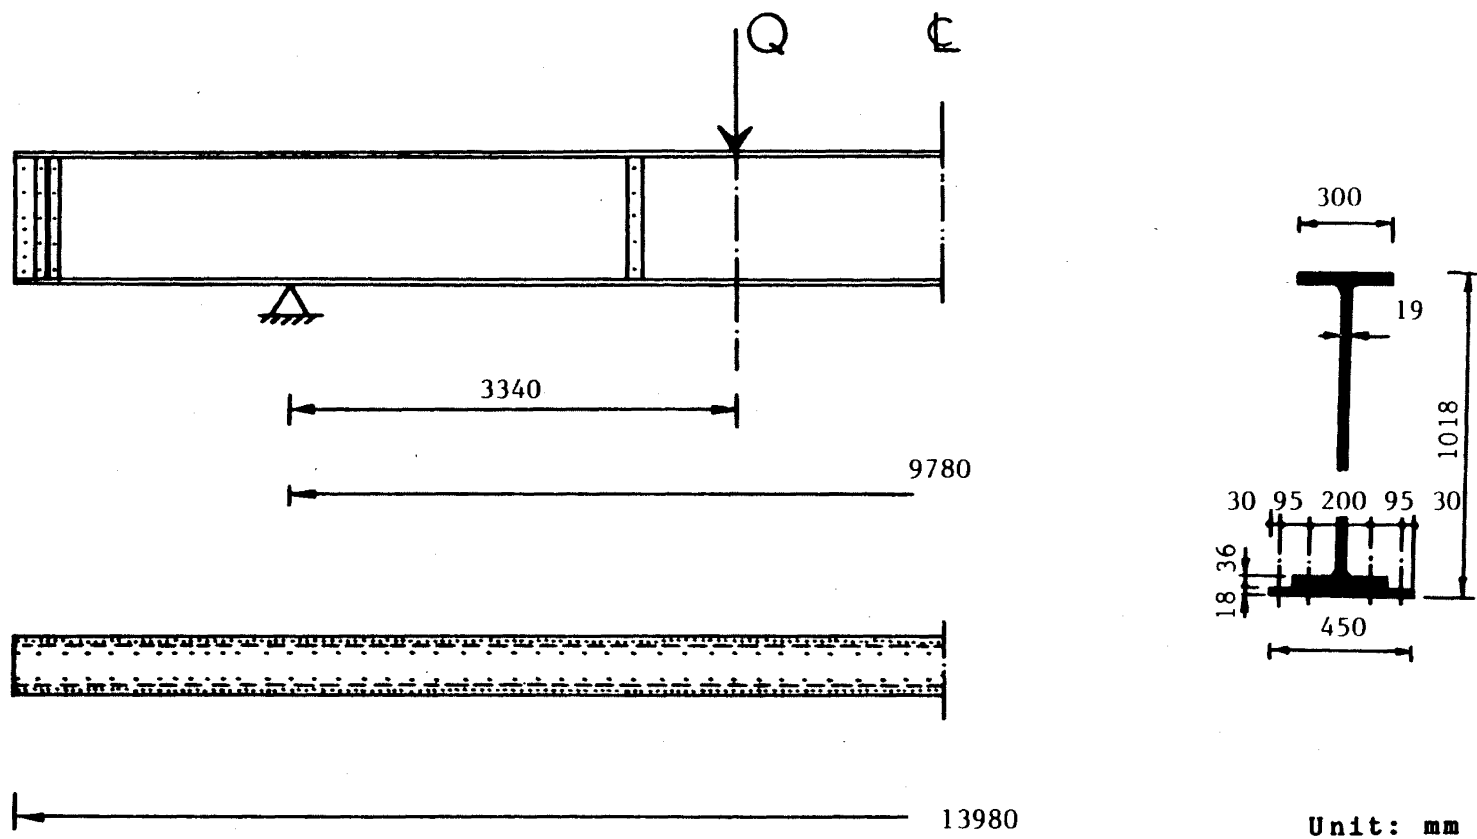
Schematic of Riveted Girder Specimen (see Ref. 31)
